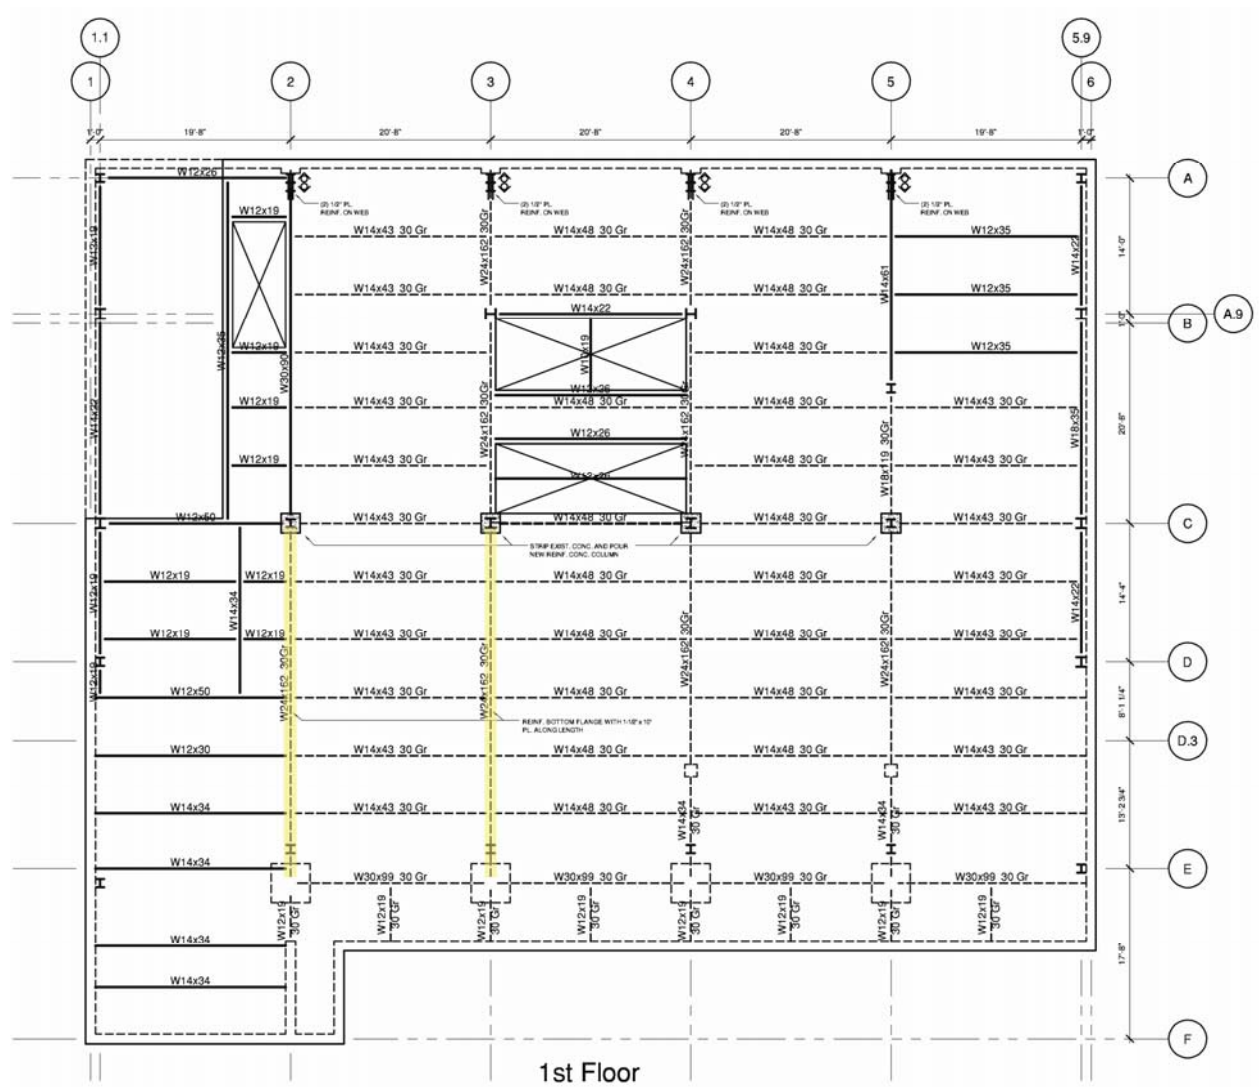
Noted girder failures on the 1<sup>st</sup> Floor
